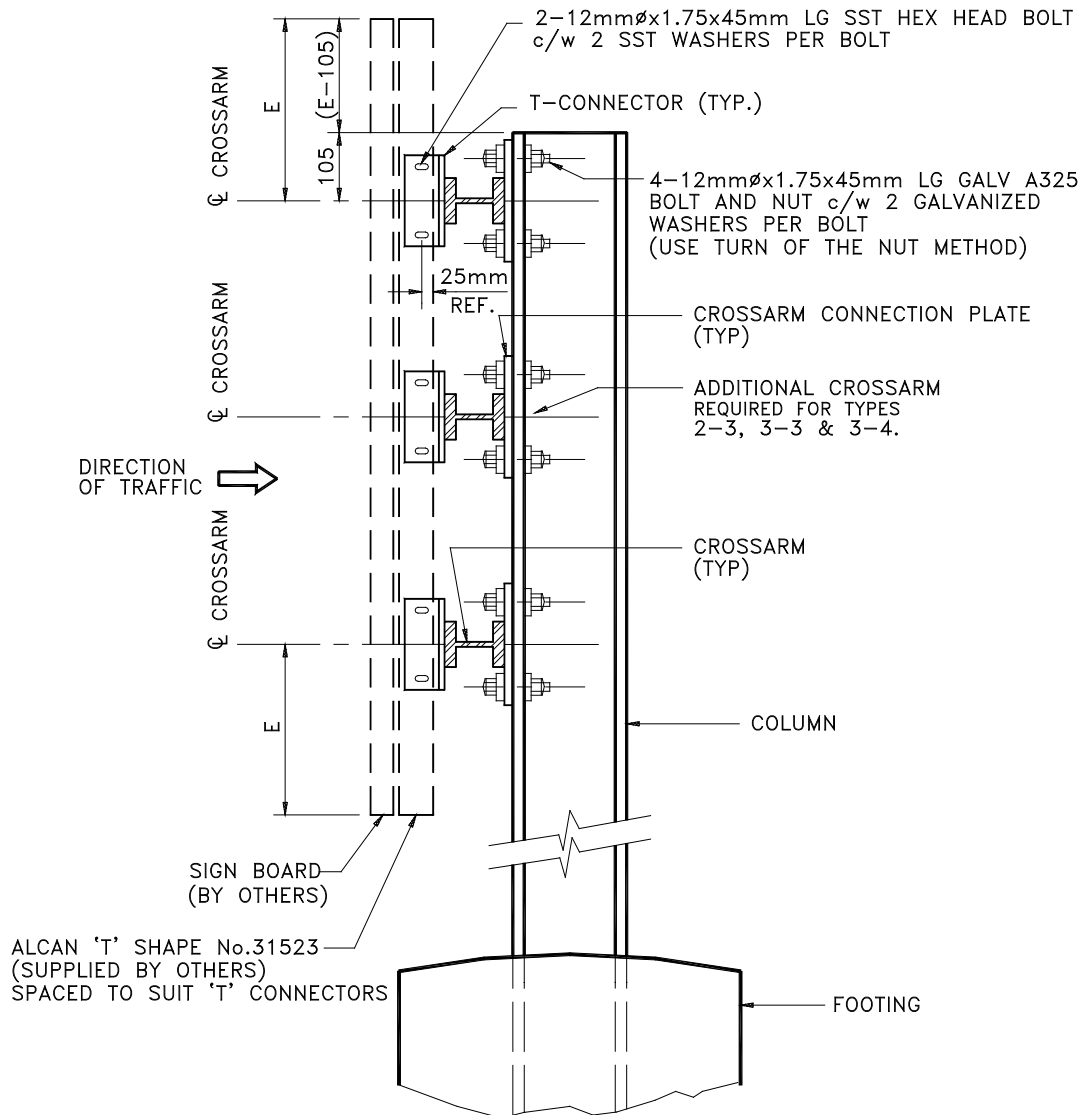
(b) NON-BREAKAWAY TYPE INSTALLATION DETAILS
